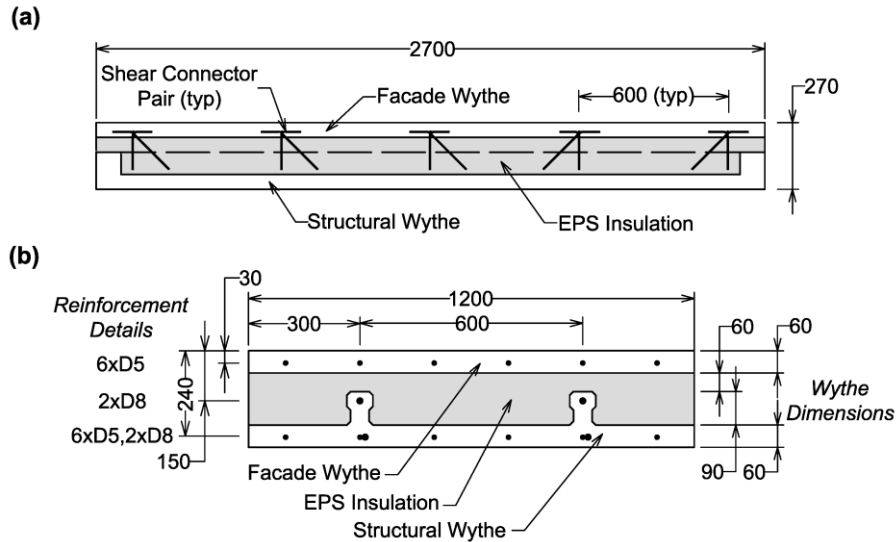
Sandwich panel drawing showing (a) elevation view with shear connector locations (b) Cross section showing longitudinal reinforcement. All dimensions in mm (100 mm = 3.94 in).
